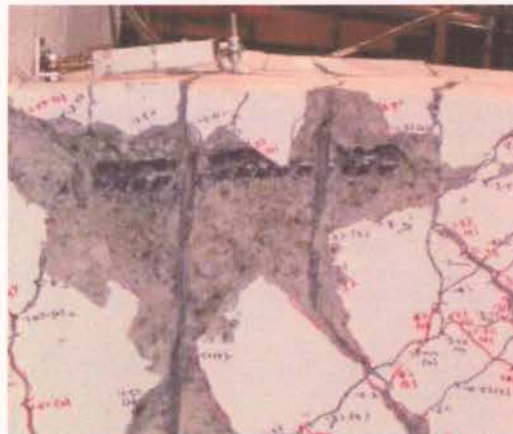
Spalled concrete exposing reinforcing after 4.5% drift (A2)
